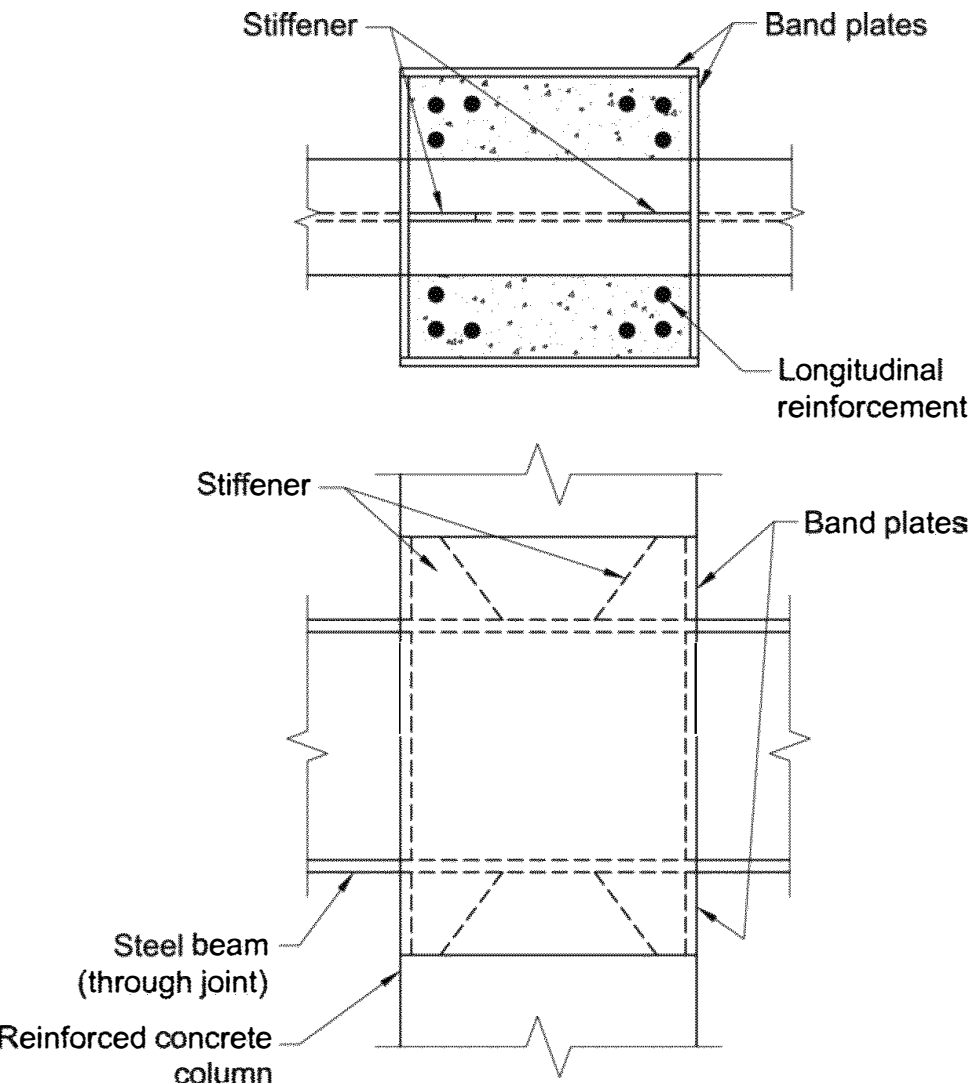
Steel band plates used for strengthening the joint.
